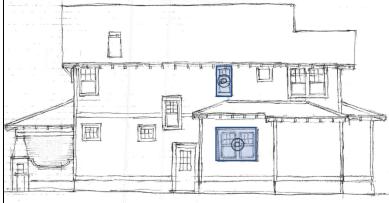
Proposed east and south elevations of main house with proposed window locations marked.
